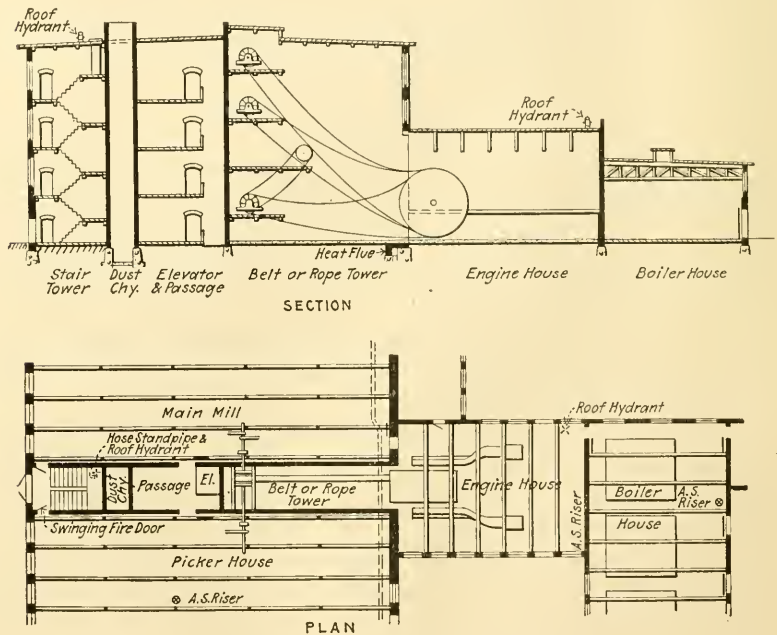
BELT, STAIRWAY AND ELEVATOR TOWERS
